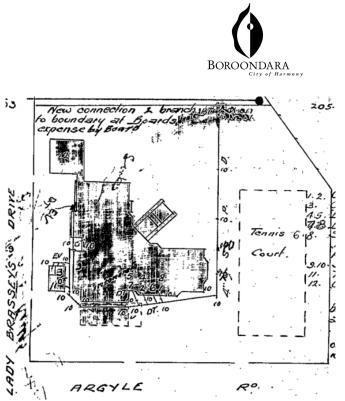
Site plan of 97 Argyle Road in 1924, showing original house and garage footprint. (Source: Yarra Valley Water, PSP 175491)
